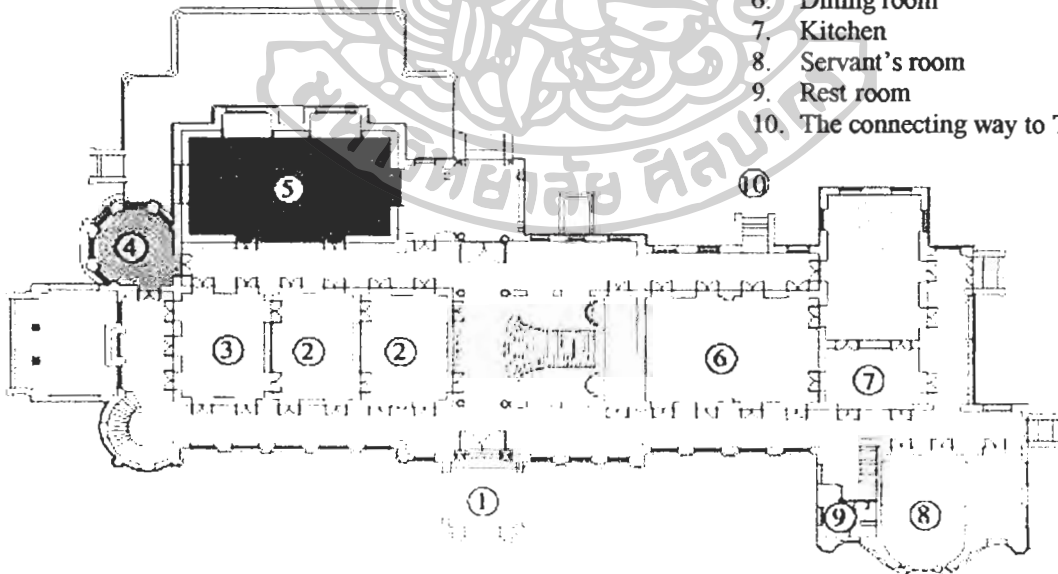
Tamnak Yai, A plan of the upper floor (Above)
